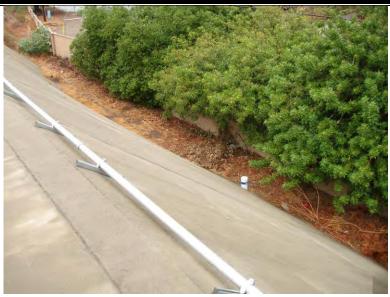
Terminal Basin Exterior Front Wall: October 9, 2013
